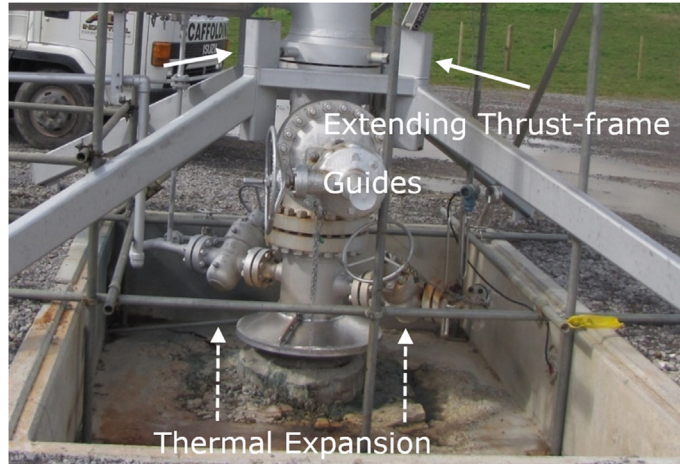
Extension of the well production casing and master valve assembly aboveground due to thermal expansion (picture by authors).
